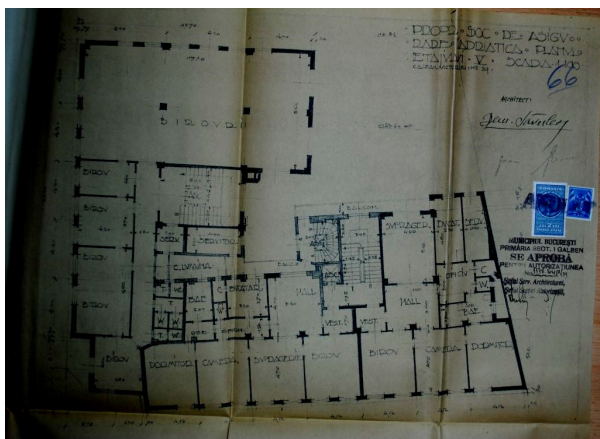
Adriatica building, Bucharest, Photo: Maria Boștenaru-Dan, 2011. Plan: Town hall of Bucharest archives (PMB fond tehnic).
